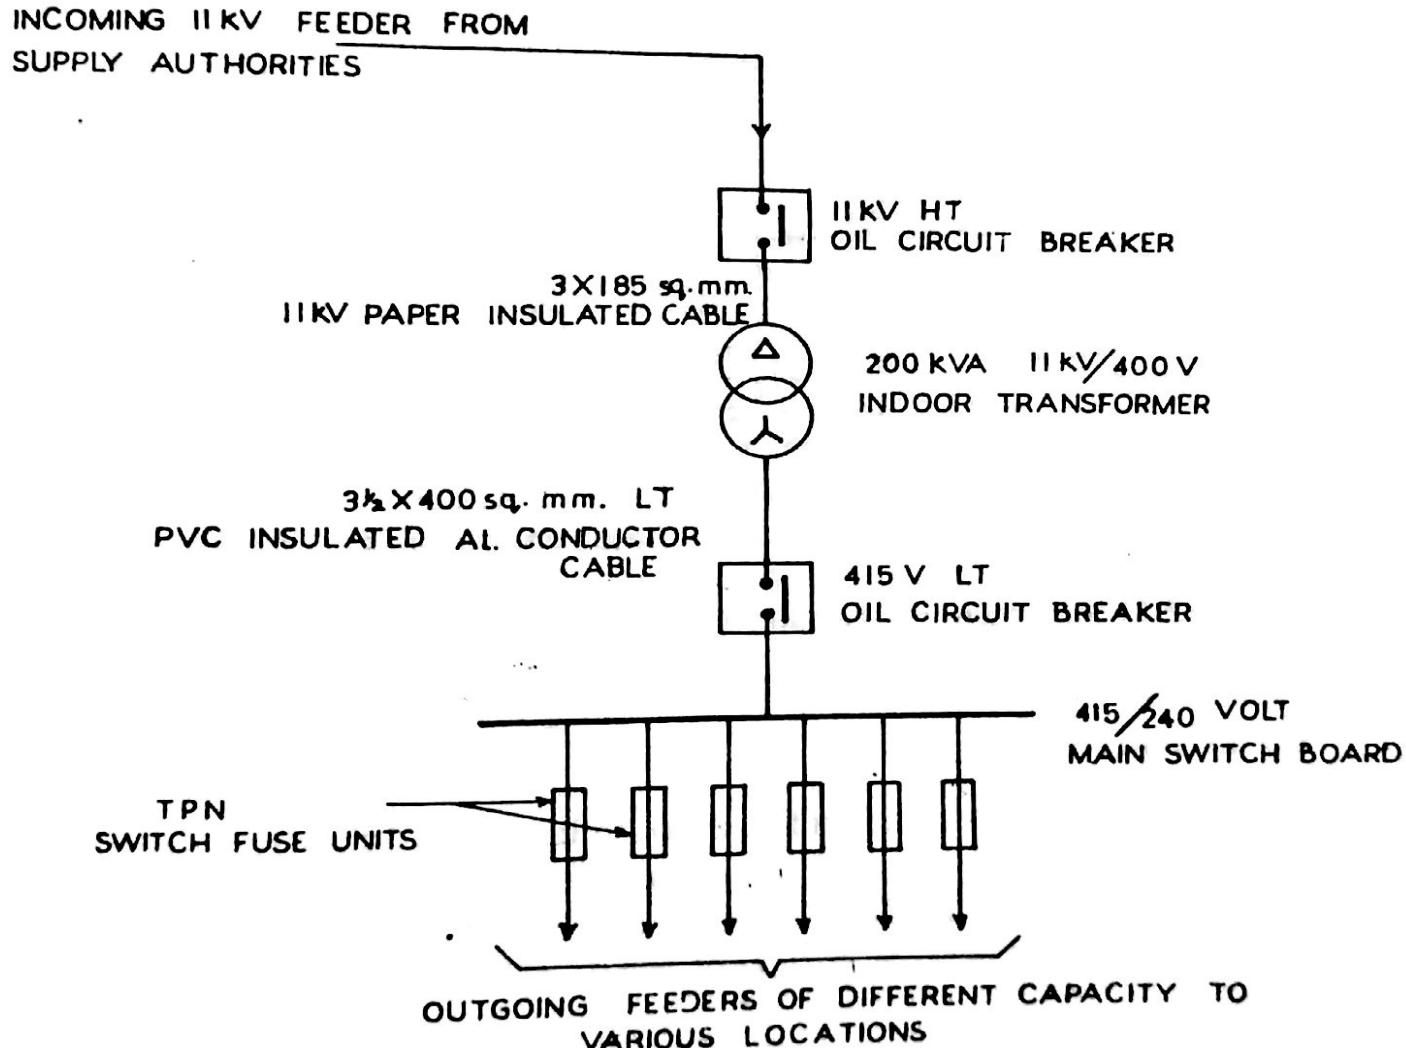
Schematic layout of a substation and low voltage switchboard.
